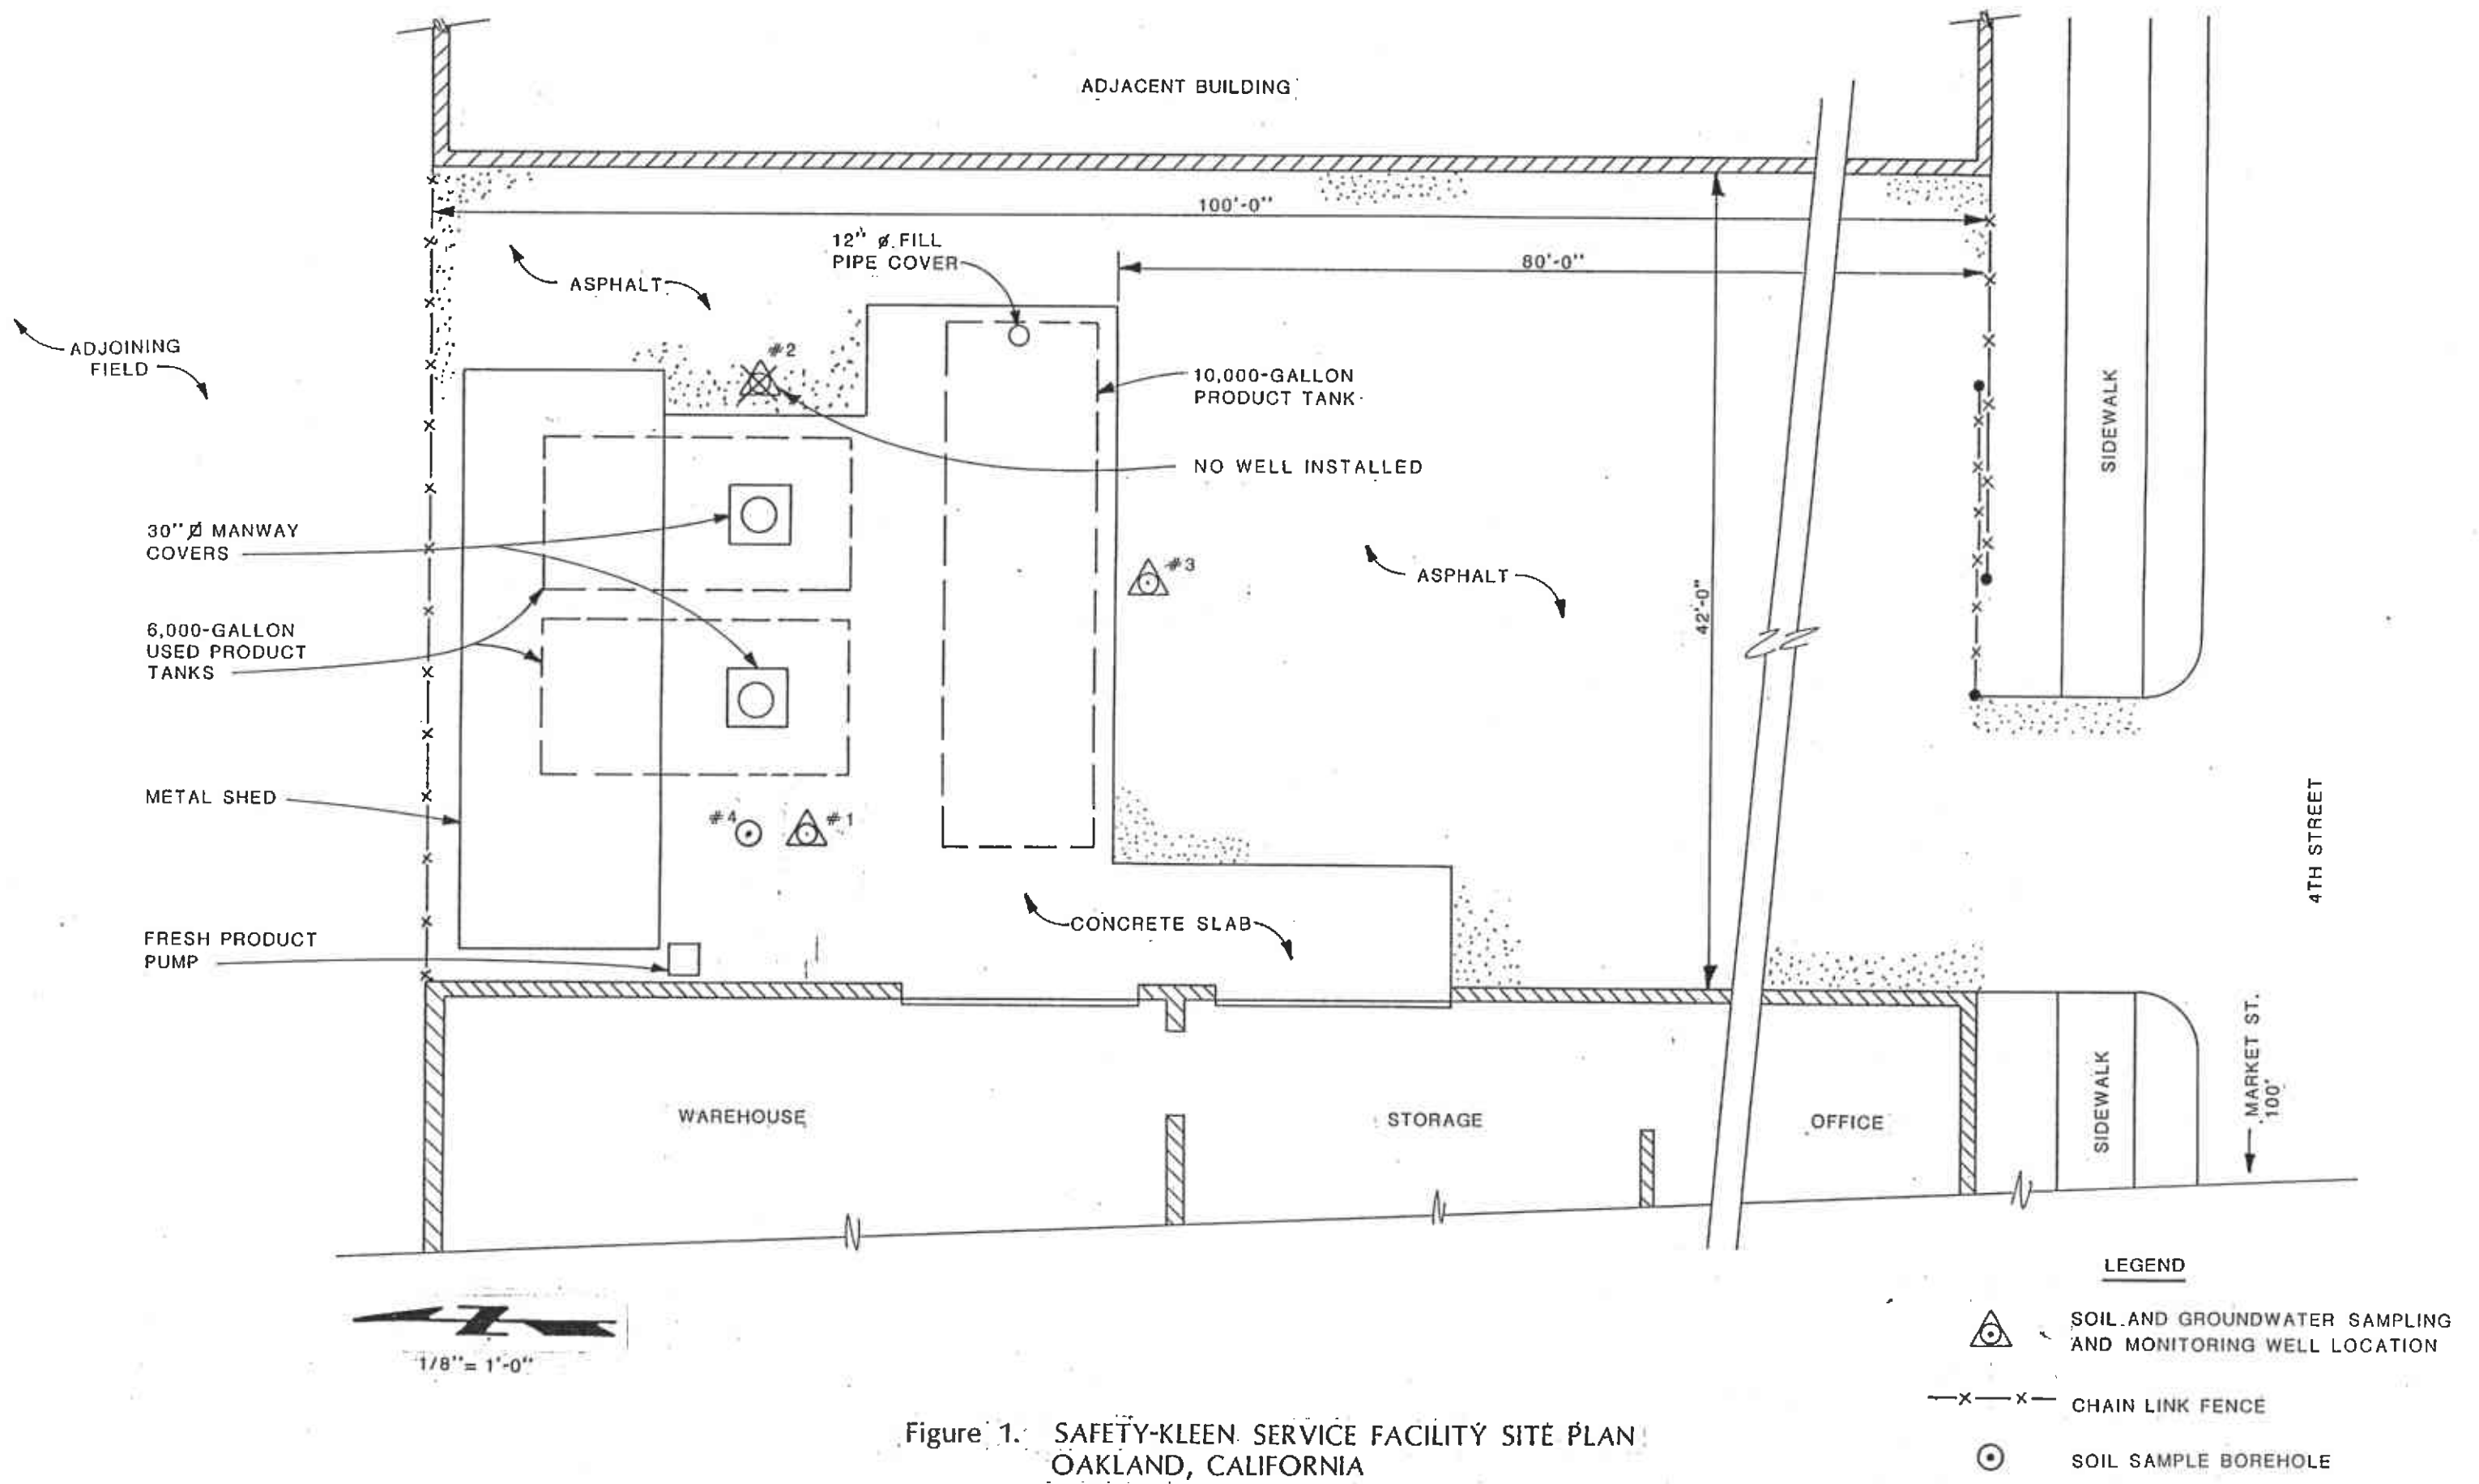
SAFETY-KLEEN SERVICE FACILITY SITE PLAN
